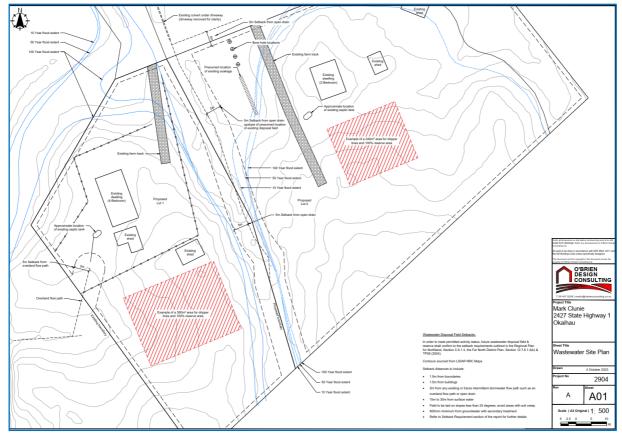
Wastewater and Stormwater Disposal on Lot 2, Sourced from FNDC Property File BC-2017-962-0 Specifications.
